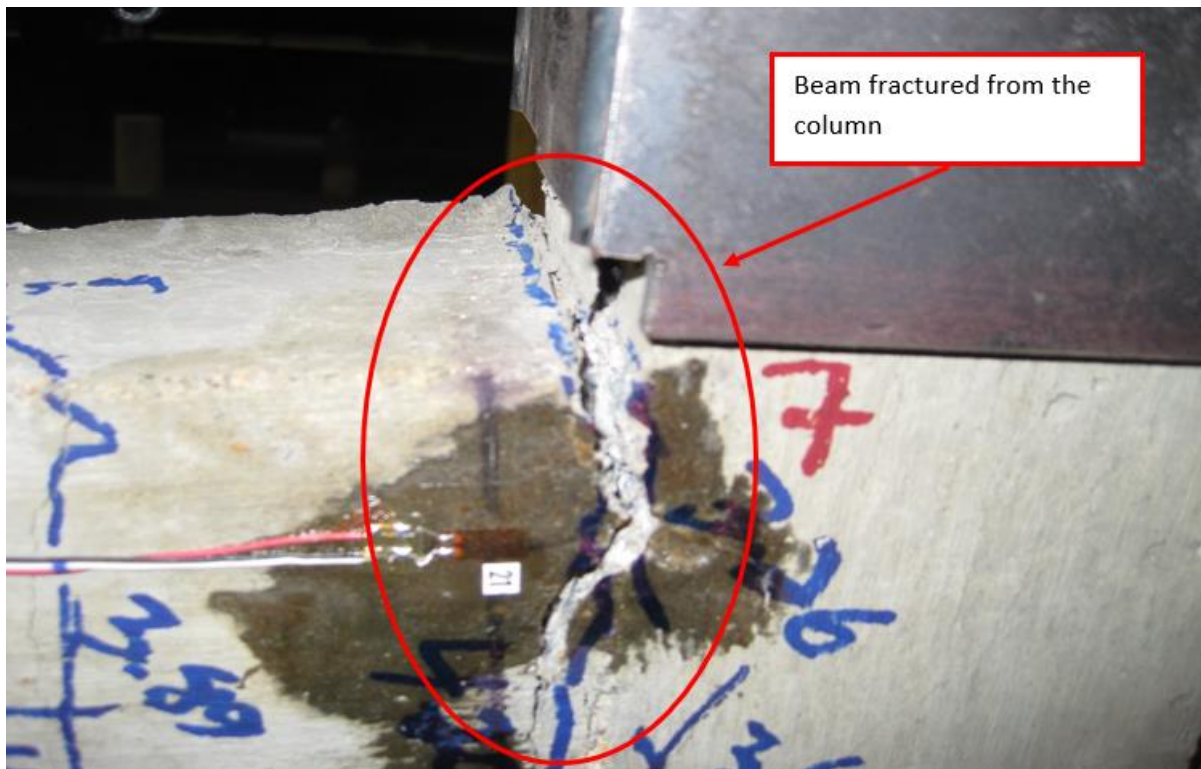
Right Support Beam Fractured from Column at the Collapsed Load for Specimen B2-2
